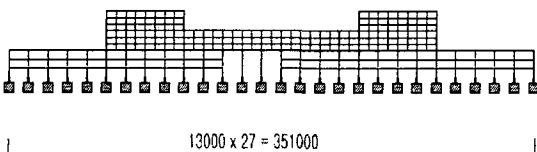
Structural elevation (X-axis, longitudinal direction)
